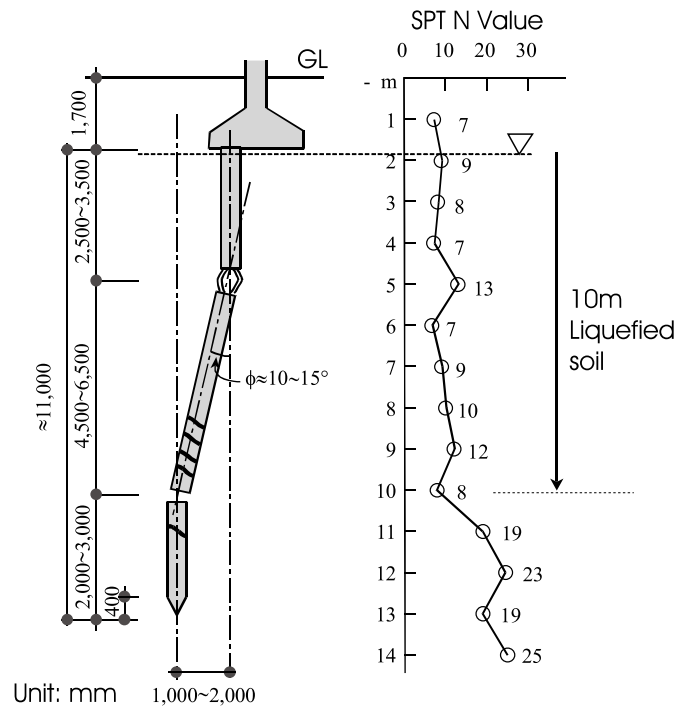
Excavated pile of NHK Building (Tazoh, 2007).
